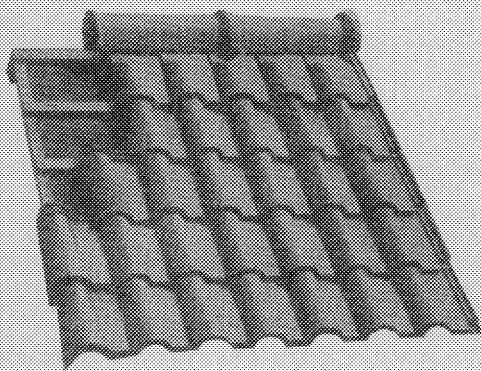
Section of a Roof, Showing Interlocking Spanish Tiles.
